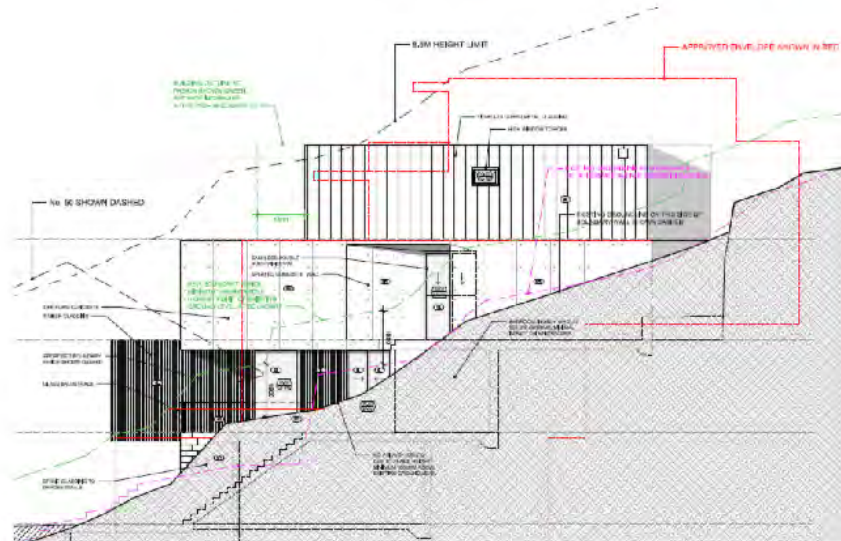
Plan extract Eastern Elevation showing minor 8.5m height breach
